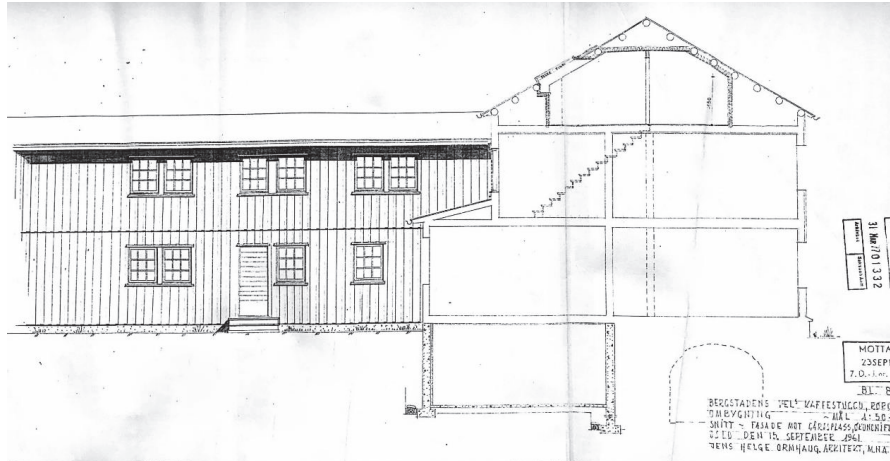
The front façade of the new annex, facing the inner yard of Kaffestuggugård and a cross section of the main building Kaffestuggu with a proposed skylight window on the back side of the roof. (Drawing by architect Jens Helge Ormhaug, 1961, Røros kommune).
